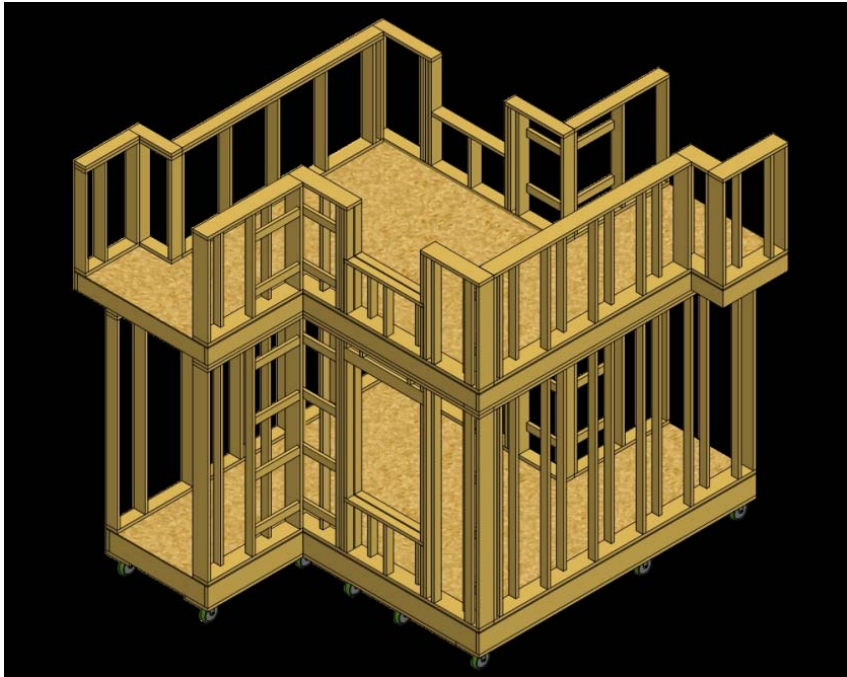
Schematic showing wall and floor structure for the wall mock-up. The staggered stud 2x8 wall system is in the foreground.
